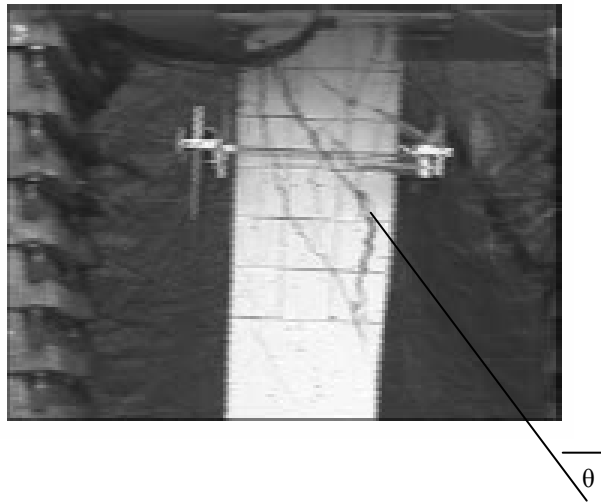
Shear failure plane in a reinforced concrete column after shear failure.
